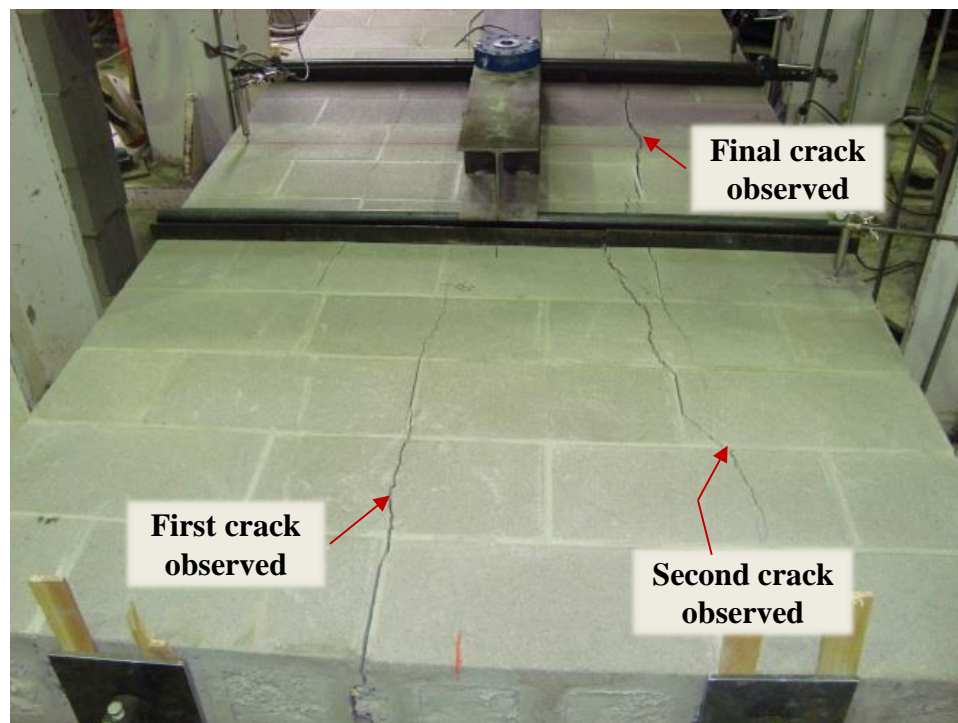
Cracking on top face of specimen W800(No.25)-3.5-3
